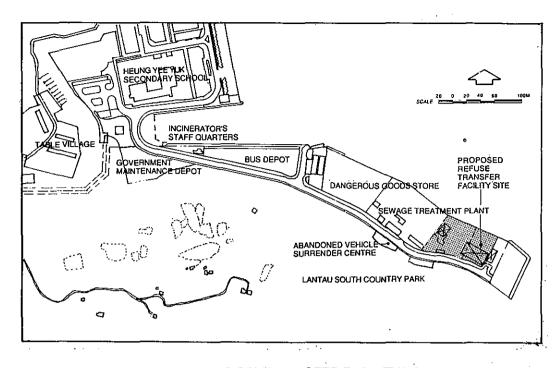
MUI WO MOTHER SITE TRANSFER FACILITY LOCATION PLAN
